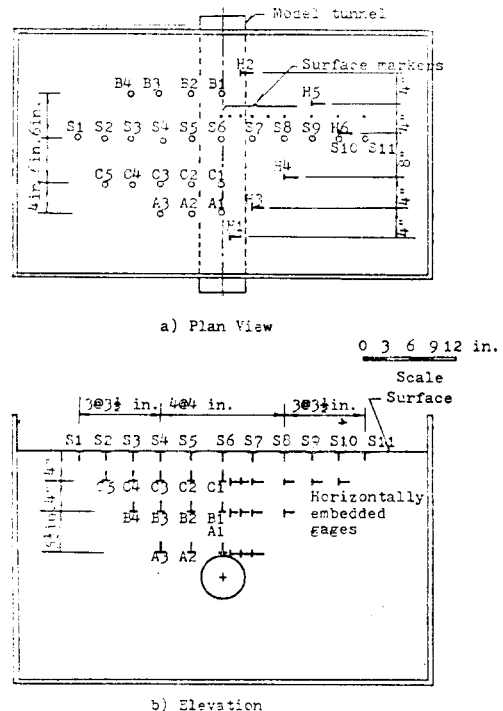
Layout of Mechanical Embedded Gages, Test L-6
